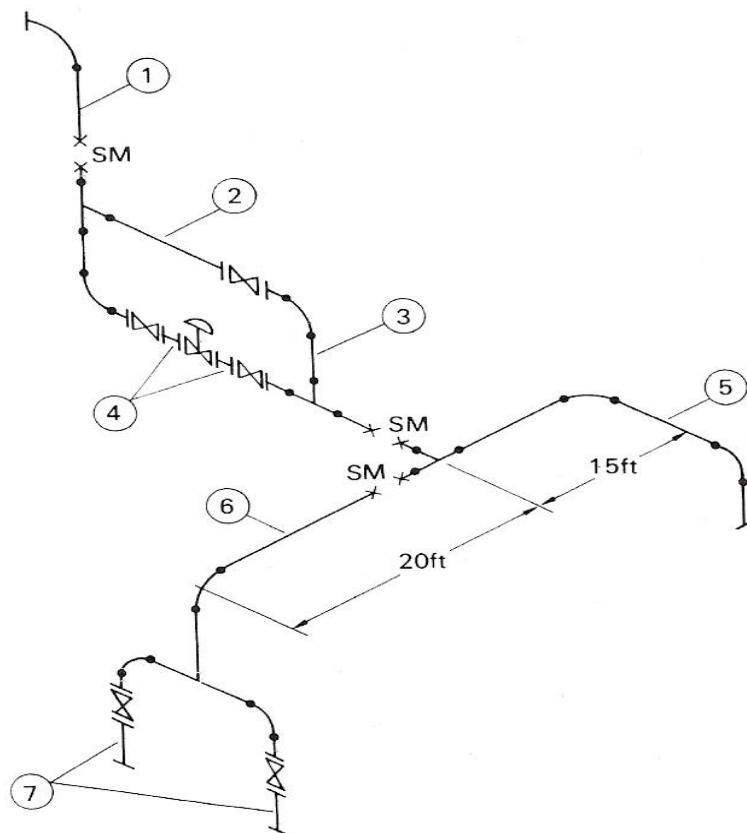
Isometric as Detailed by Designer and Presented to Fabricator
